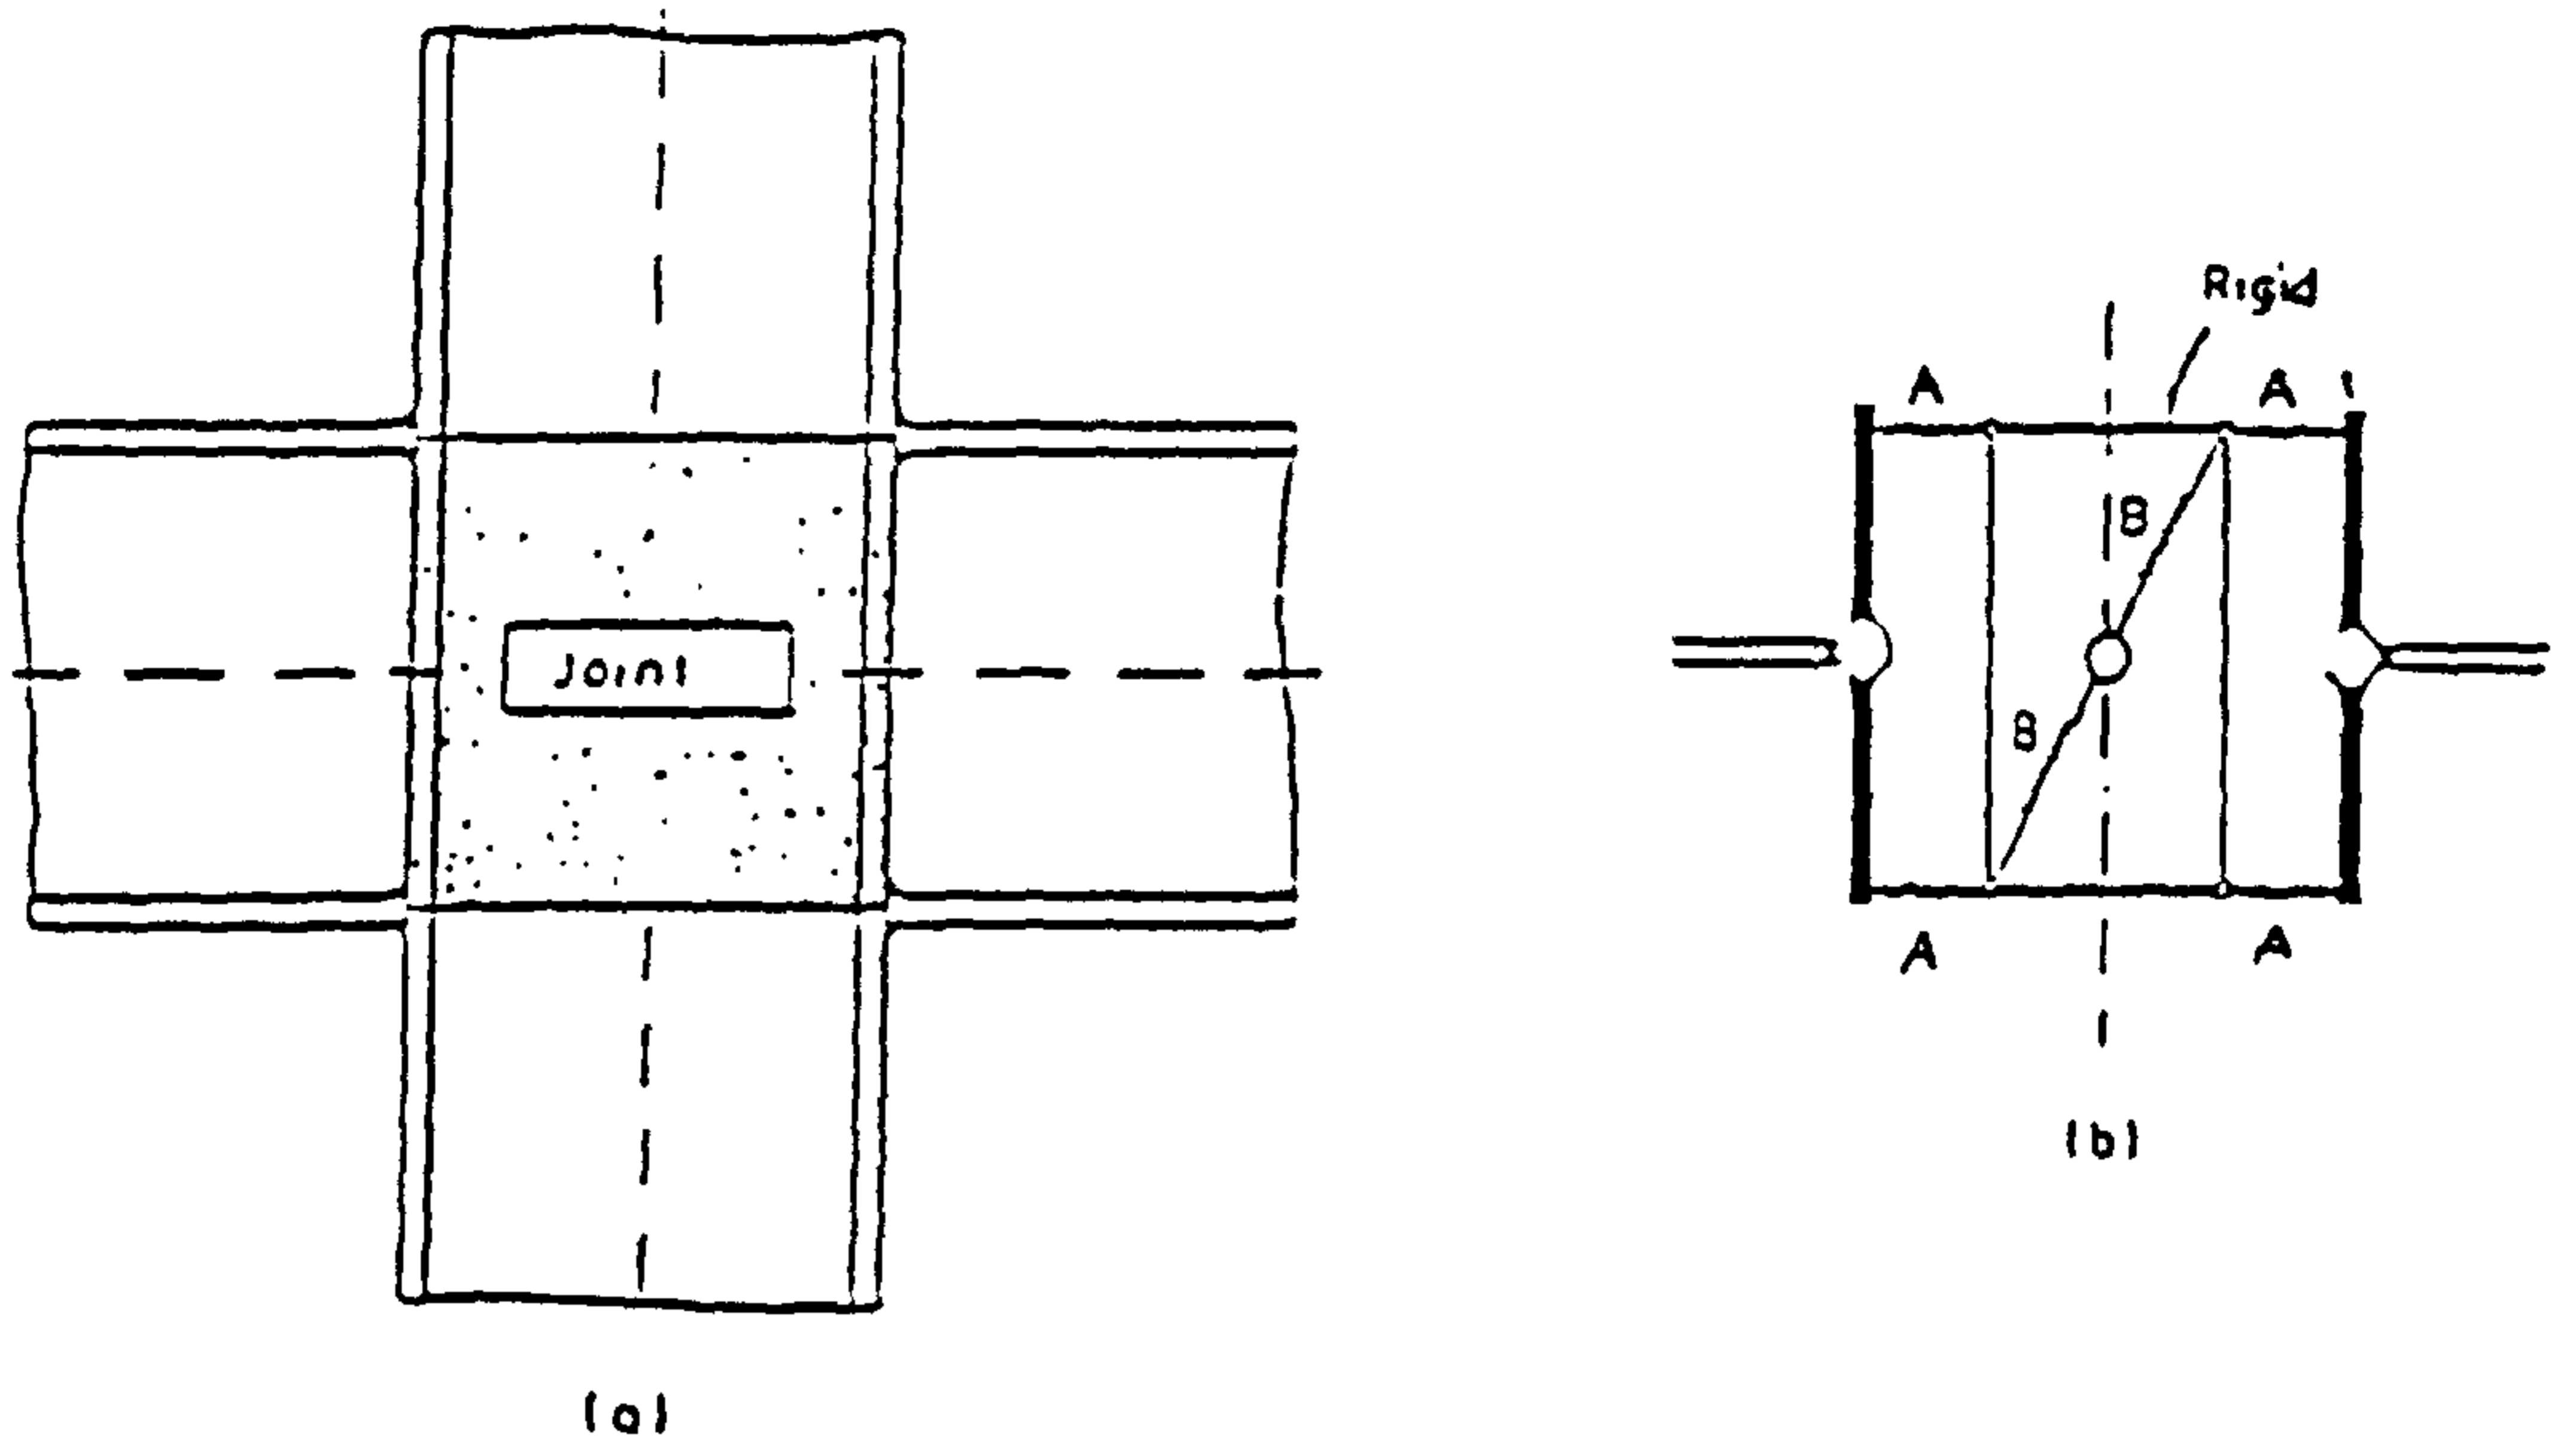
Mechanical model of a full welded joint (Tschemmernegg, ref. 1-31)
